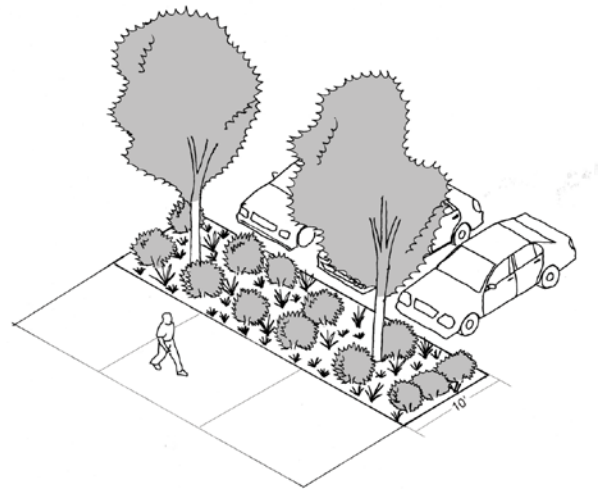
10-foot parking lot buffer with Landscaping Type C.
